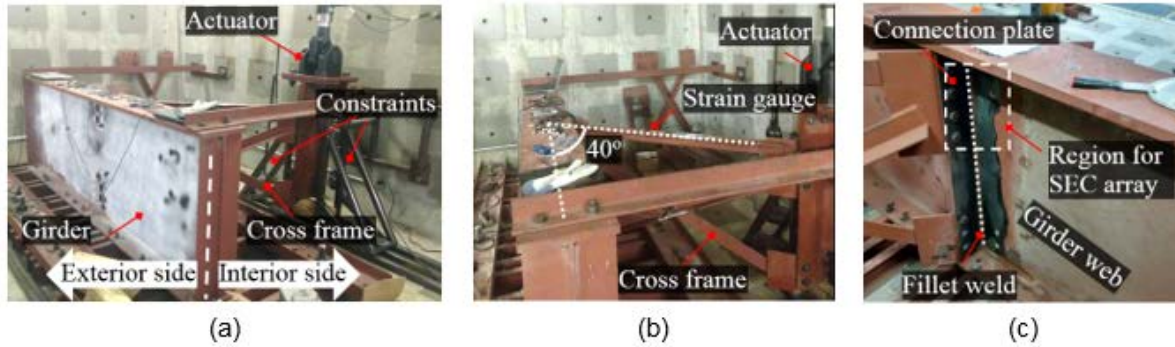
(a) Exterior View of the Test Model; (b) Interior View of the Test Model; (c) Detailed View of the Connection Plate
